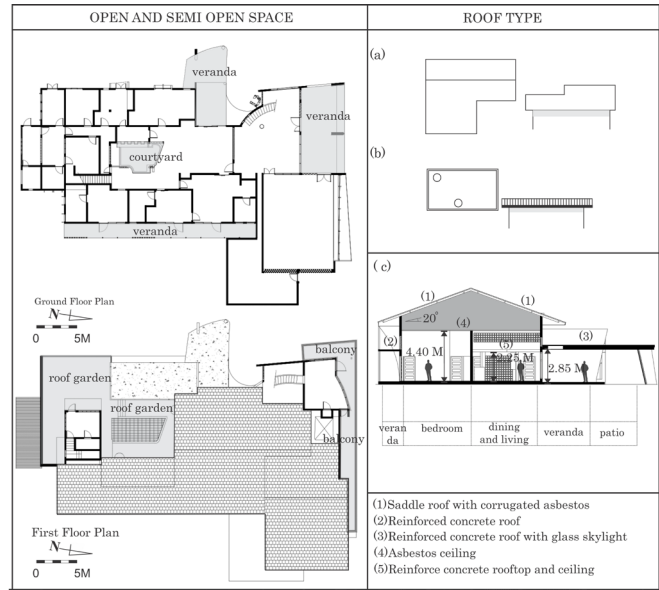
Open and semi-open spaces and the roof type of Paulus Sunarto's House
